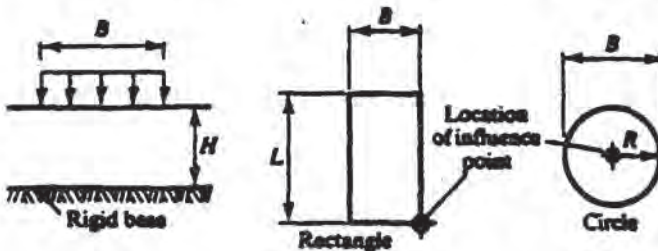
Notation for loaded area, shown in plan view. (U.S. Navy, 1962.)
